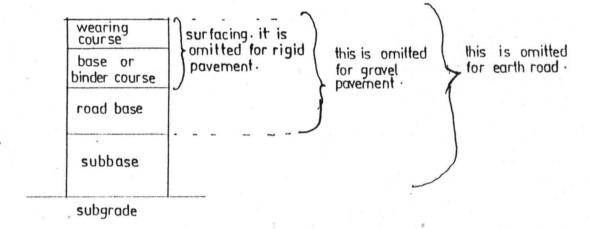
SHOWING PAVEMENT DESCRIPTION.
